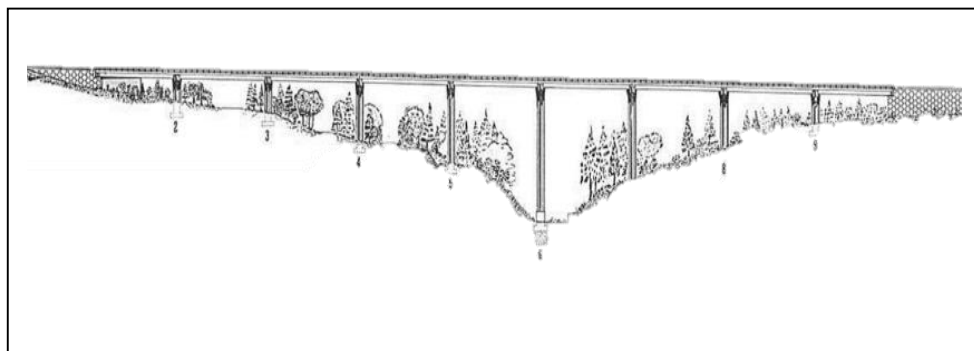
Profil of Charmaix bridge (retour d'expérience sur les fondations d'ouvrage d'art).
